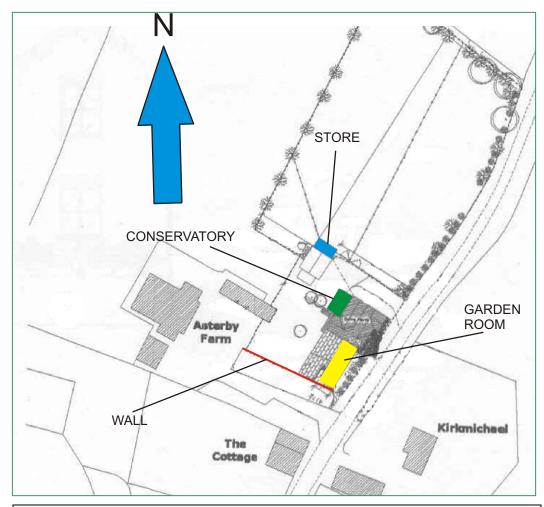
Proposed site layout showing location of Store, Conservatory, Garden Room and Boundary Wall at original scale of 1:250.
